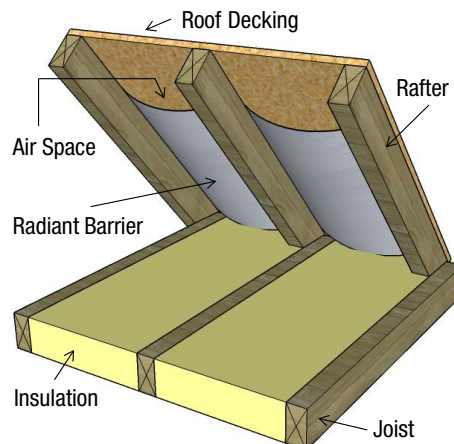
Skipped sheathing removed, radiant barrier draped over the top of the rafters, solid roof decking installed over the radiant barrier.
